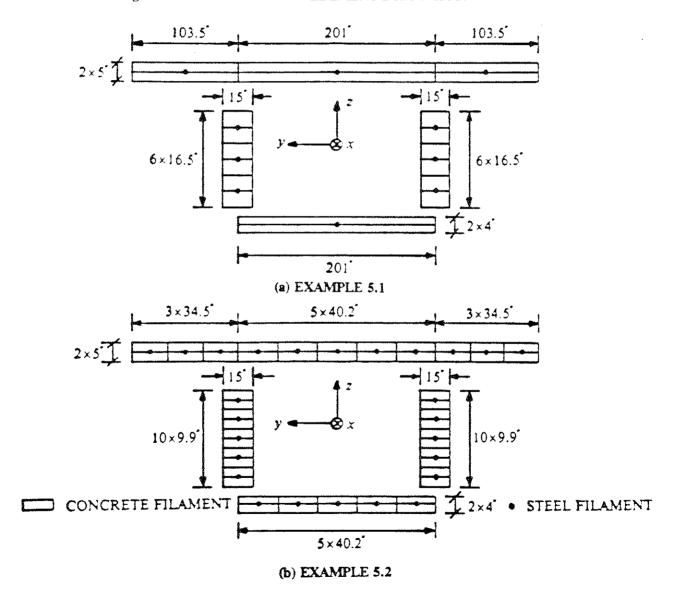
EXAMPLE 5.1 & 5.2 - DISCRETIZATION OF CROSS-SECTION INTO CONCRETE AND LONGITUDINAL STEEL FILAMENTS Choudhury [30]
